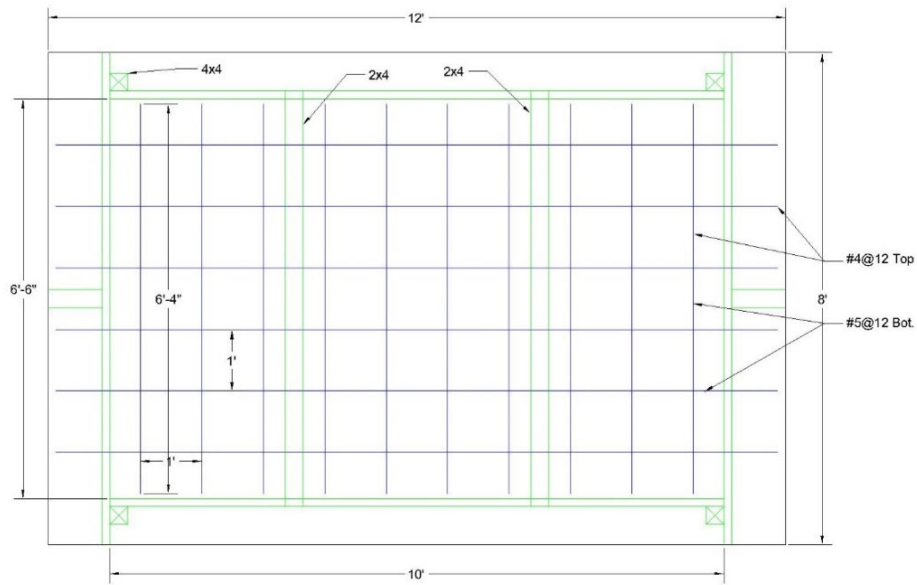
Dimensions and reinforcement of deck slab specimens
